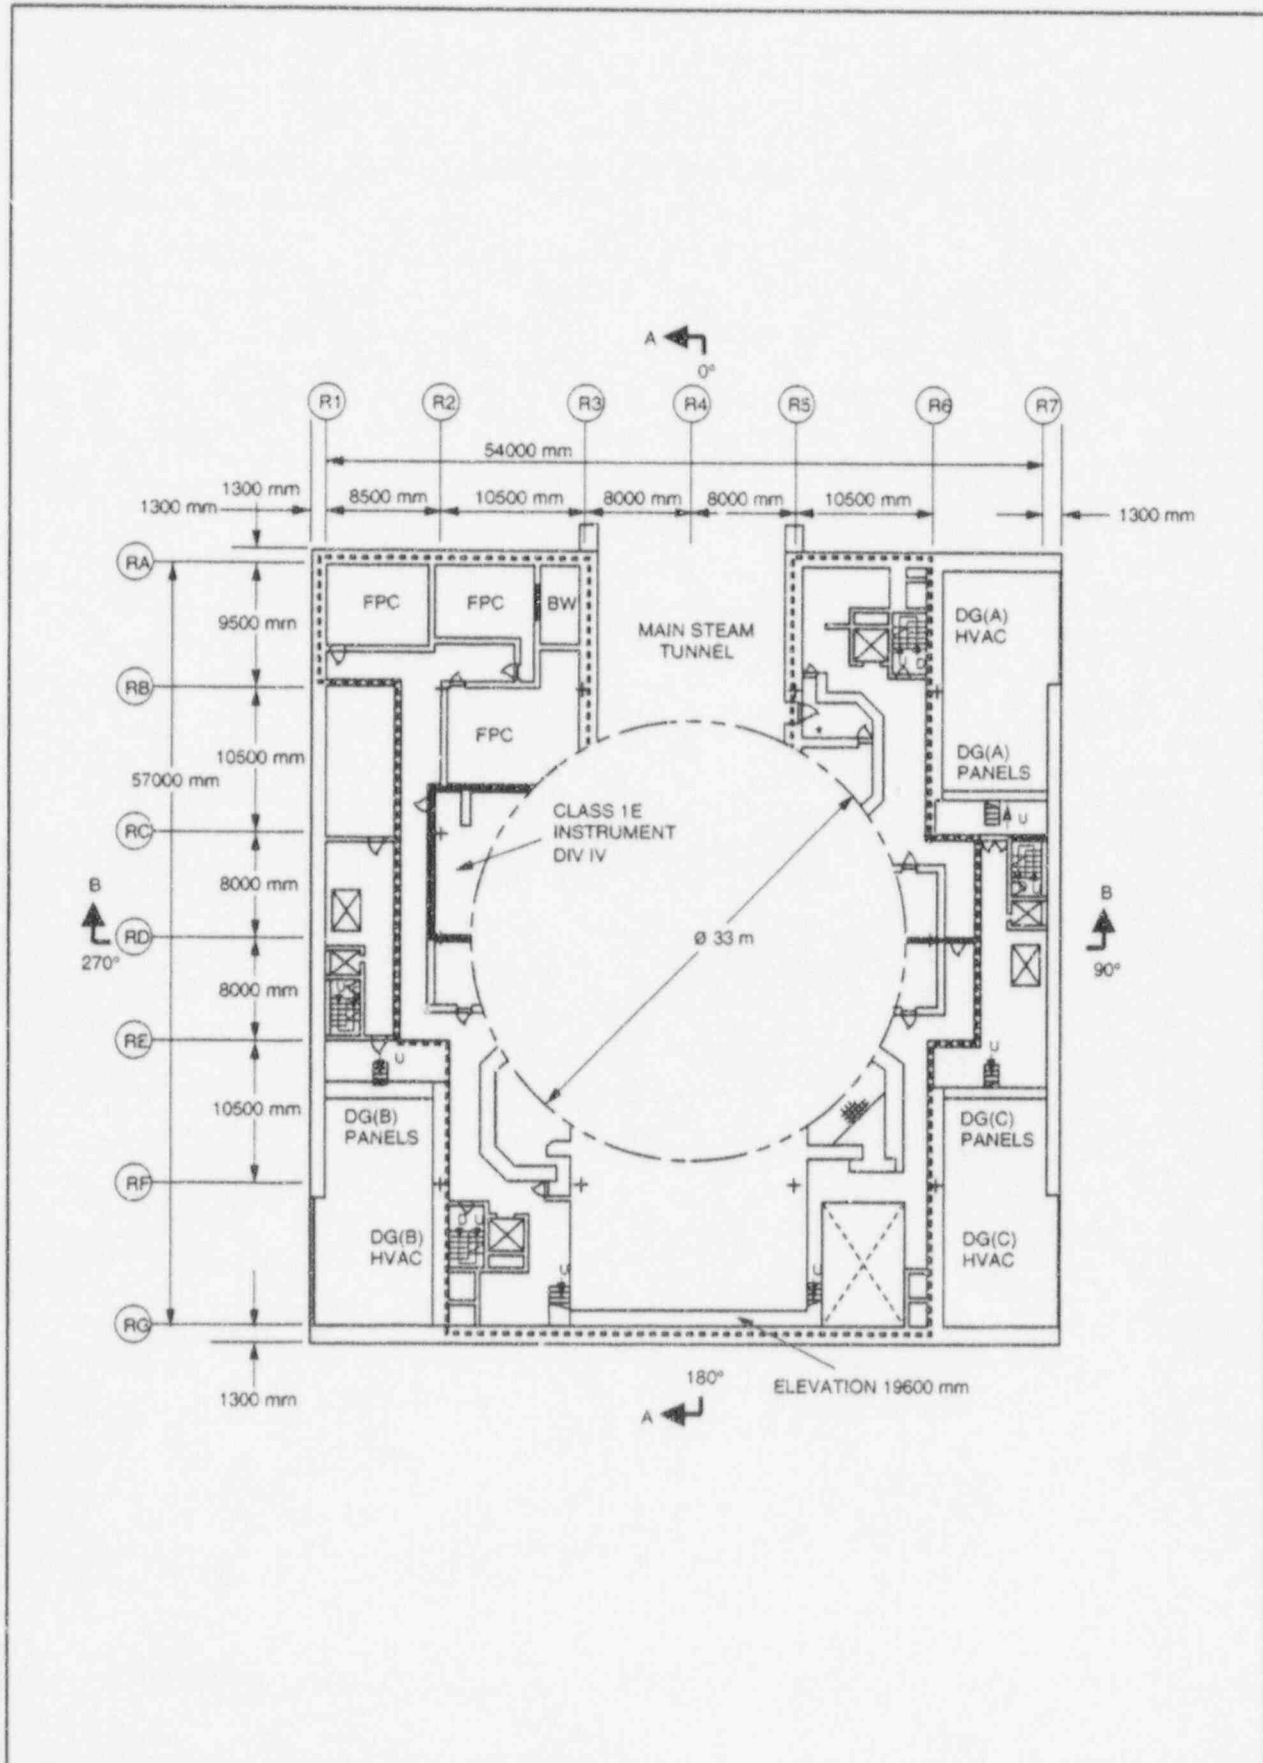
Reactor Building Arrangement, Floor 2F—Elevation 18100 mm
